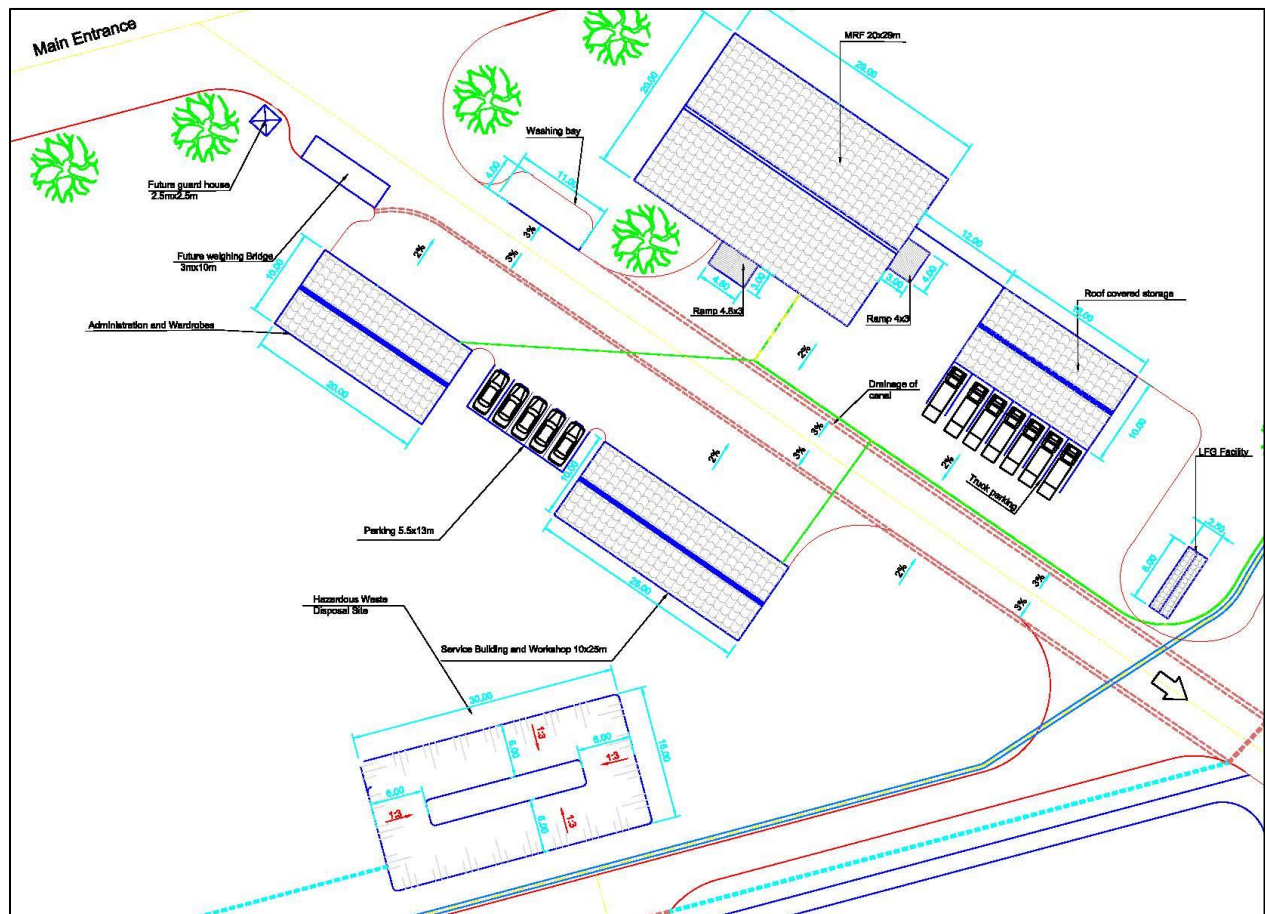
Layout of utility buildings, MRF, and hazardous waste storage
